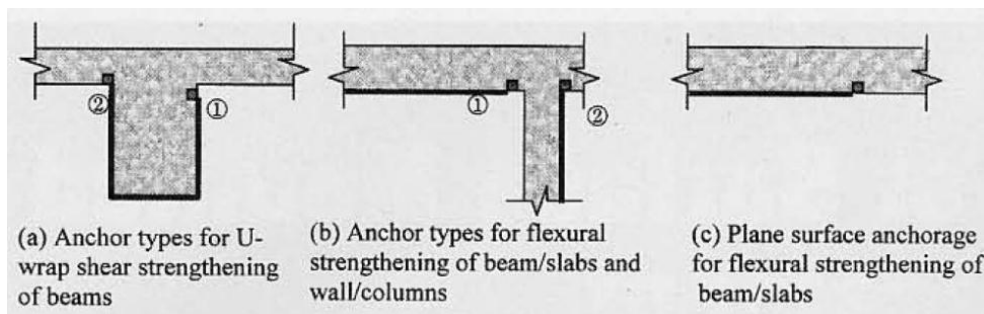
U-jacket anchor detail (Kalfat, et al., 2011)
